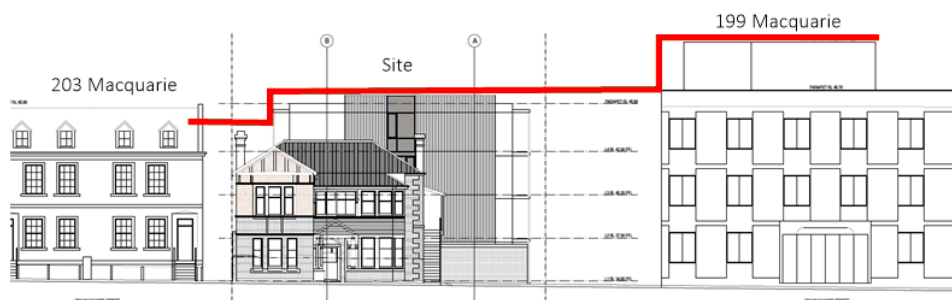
Macquarie Street elevation depicting transition in height between adjoining buildings and proposed development (source: Rosevear Stephenson)
